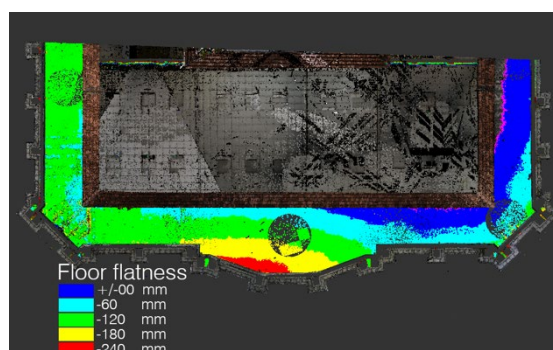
Sloping floor direction of the Ipoh Town Hall Veranda
